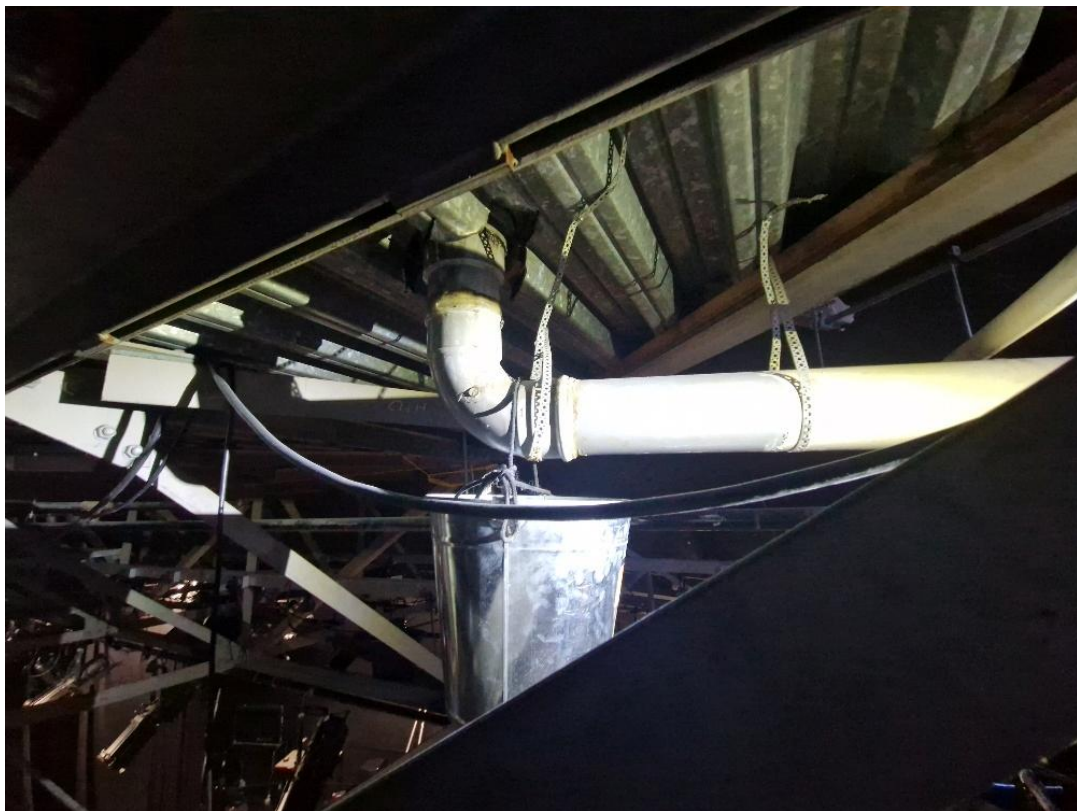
Shows problems with roof leaks currently being addressed in 2025 repairs
